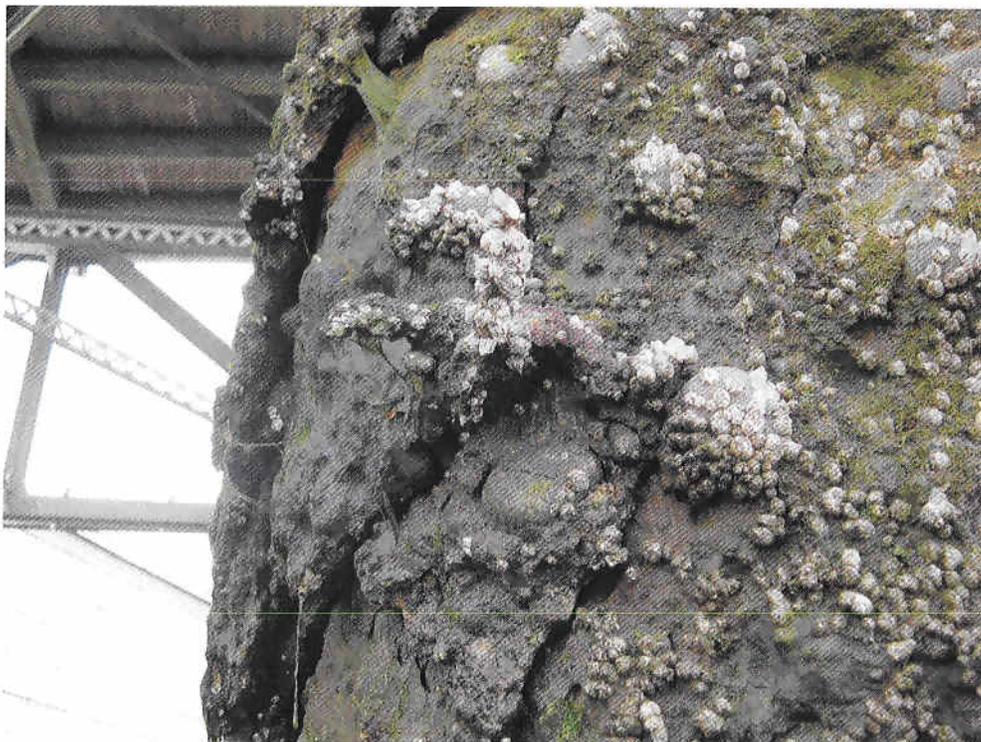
East face of North Bascule Pier abrasion in intertidal zone, spalling concrete at corners of tower, longitudinal cracks, and transverse leaching cracks.
